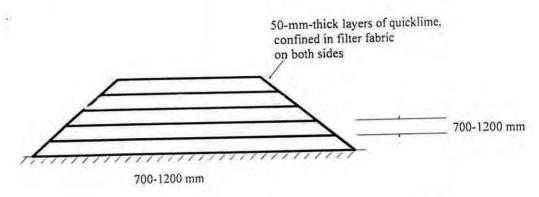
Embankment Construction using Quicklime Sandwich.
